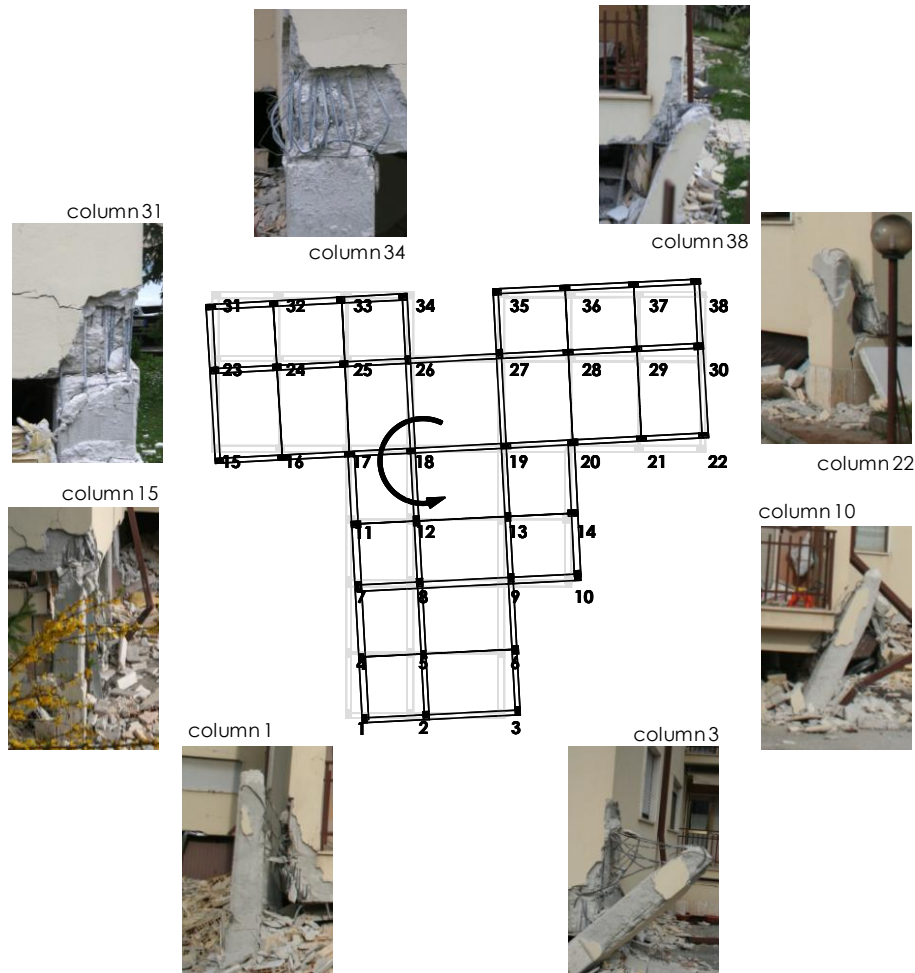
Building collapse: column damage points out a rotational movement
